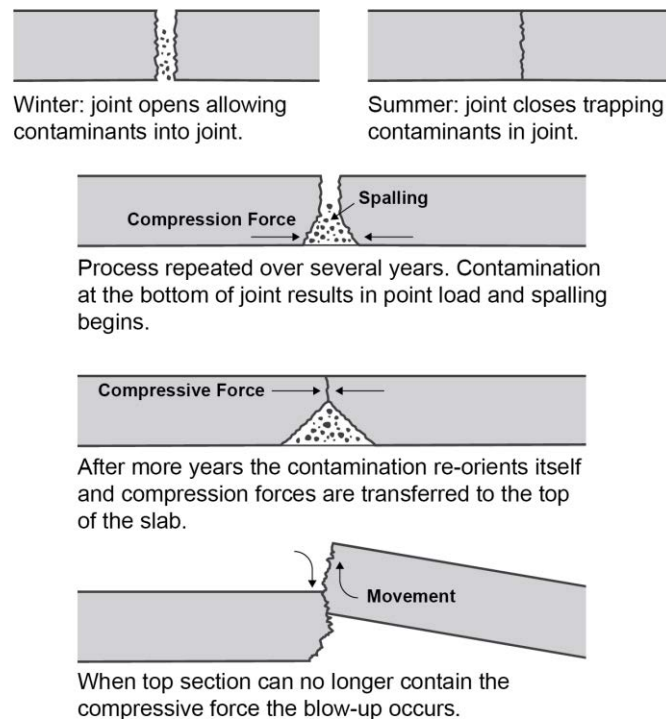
Mechanism of pavement buckling (adapted from McBride and Decker 1975).
